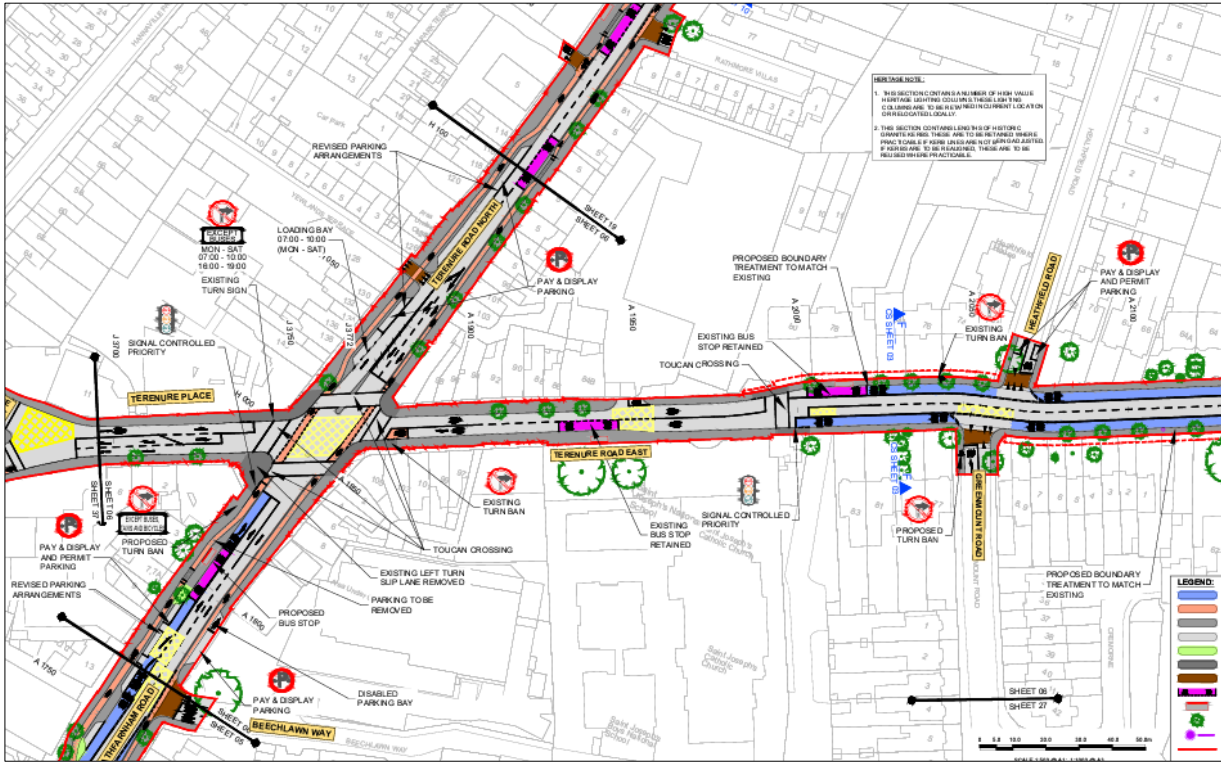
Extract from General Arrangement Drawings (Sheet 5)
